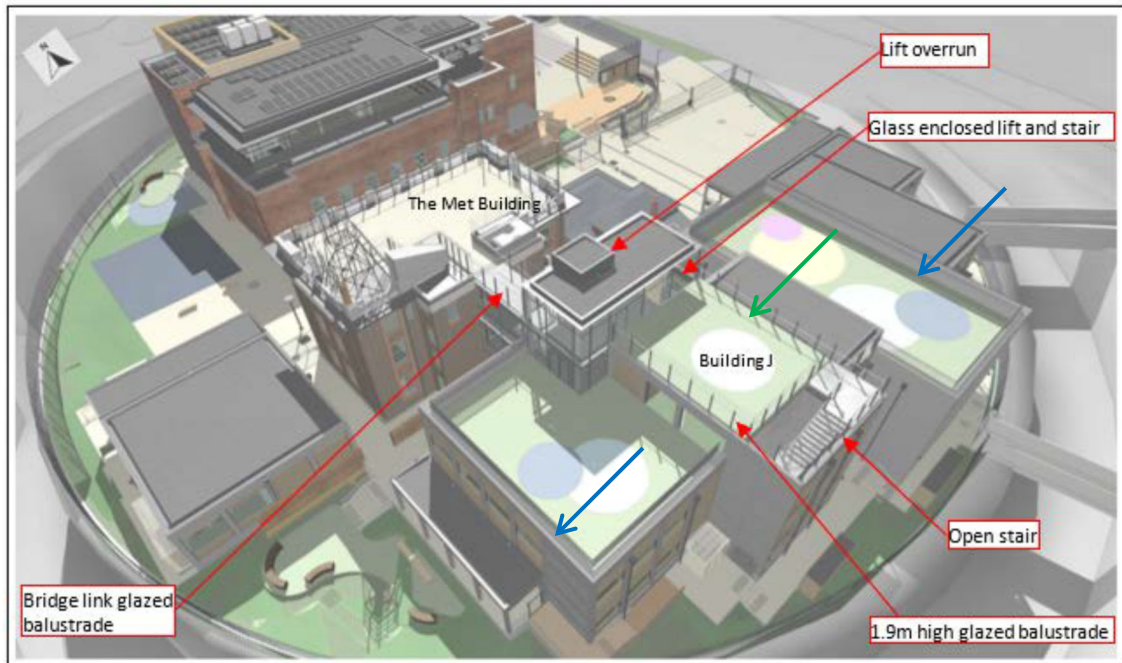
The Assessment Report, with the Safety Protection Structures to Building J & H which comprise palisade balustrade and parapet to the east (Building H) and west (Building J) portions (blue arrow) and a central (Building J) glazed balustrade (green arrow) (Figure 30 | Building J revised rooftop (Source: SRTS 2021), Modification I (SSD-10340-MOD-1) | Modification Assessment Report, p37).
